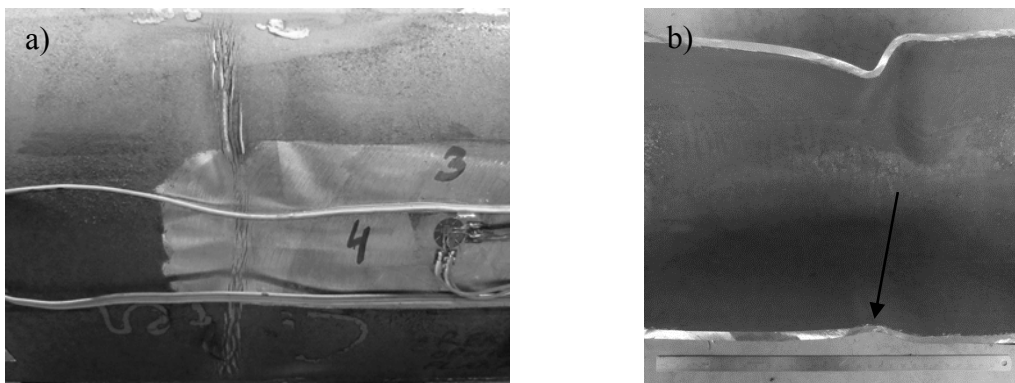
Fracture location from Test B: a) detail view of a macroscopic crack; b) section view of the buckled section [7].
